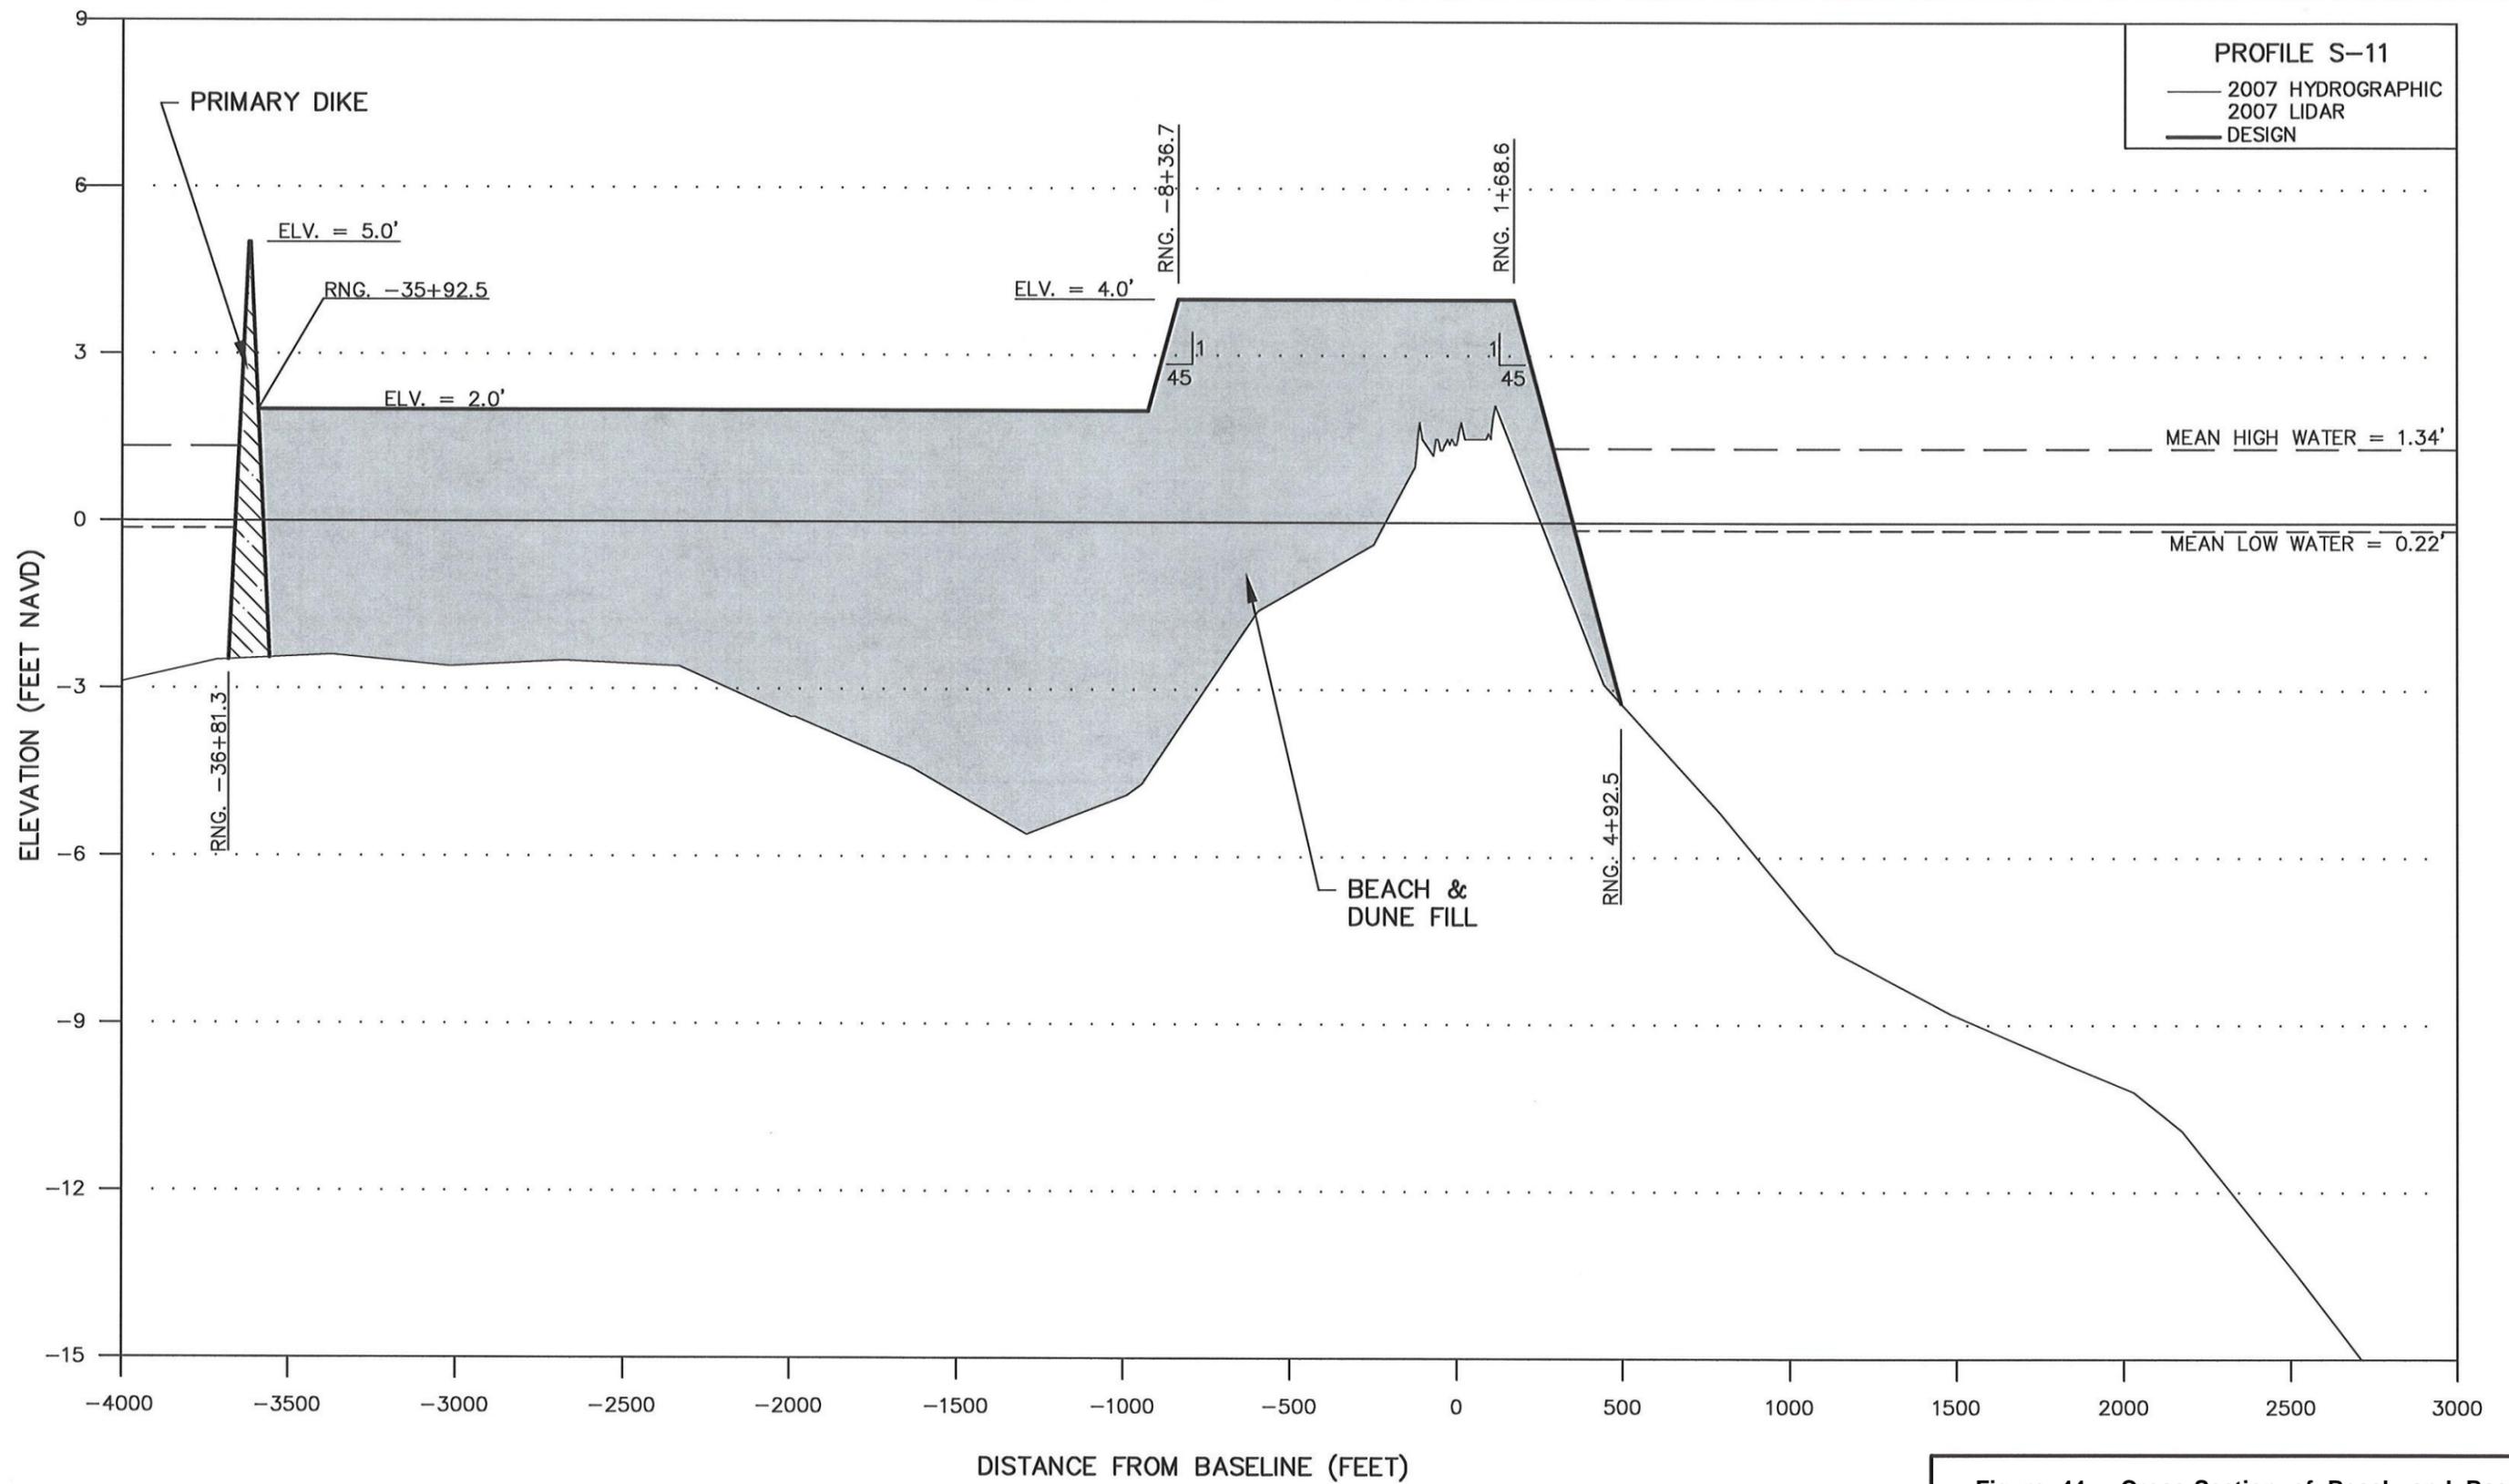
Cross-Section of Beach and Backing Marsh for Breton Island.
